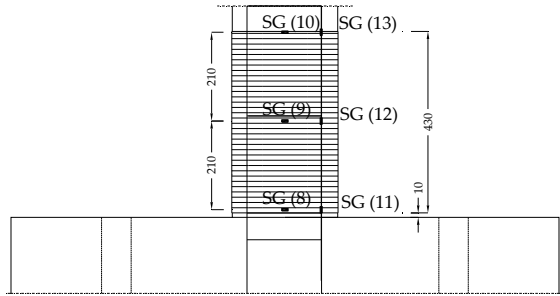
Positions of the SG on the CFRP sheet (SG8 to SG10) and laminate (SG11 to SG13) (dimensions in mm)
